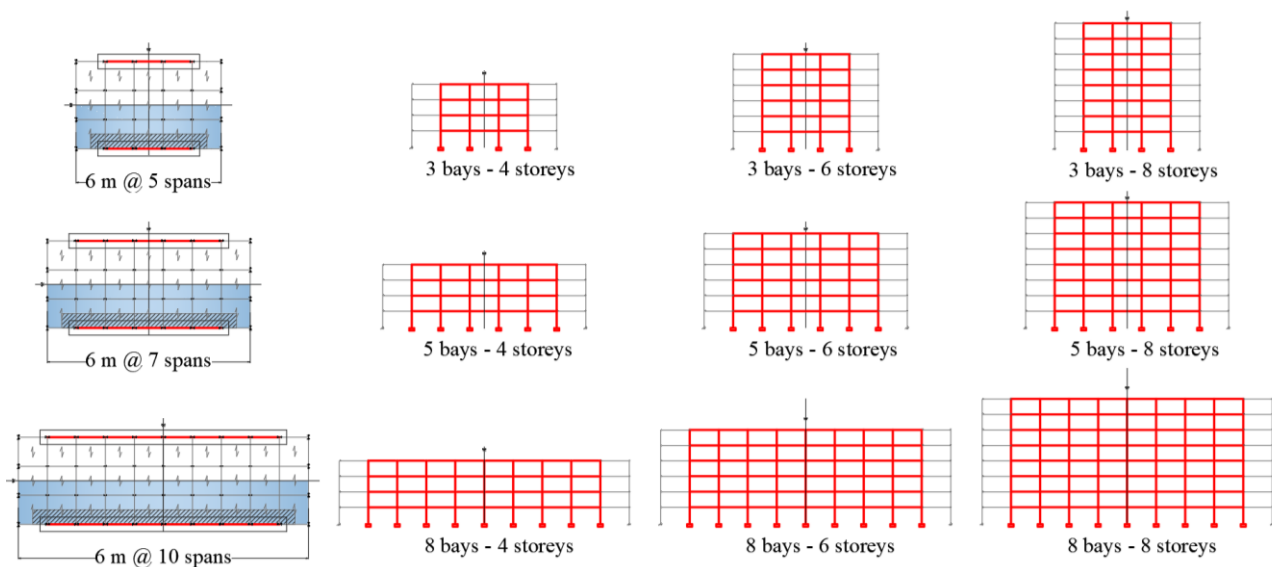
Case-study buildings: (a) Plan views; (b) Elevation views.
